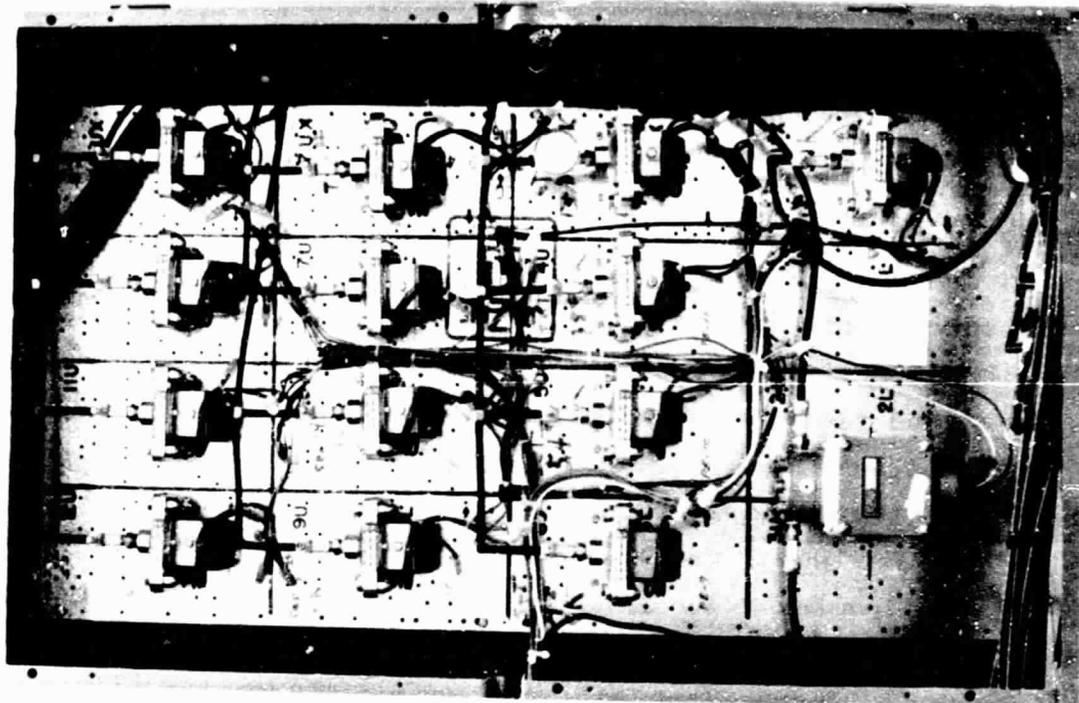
Solar System Control Panels—Main Floor Storage Room.
